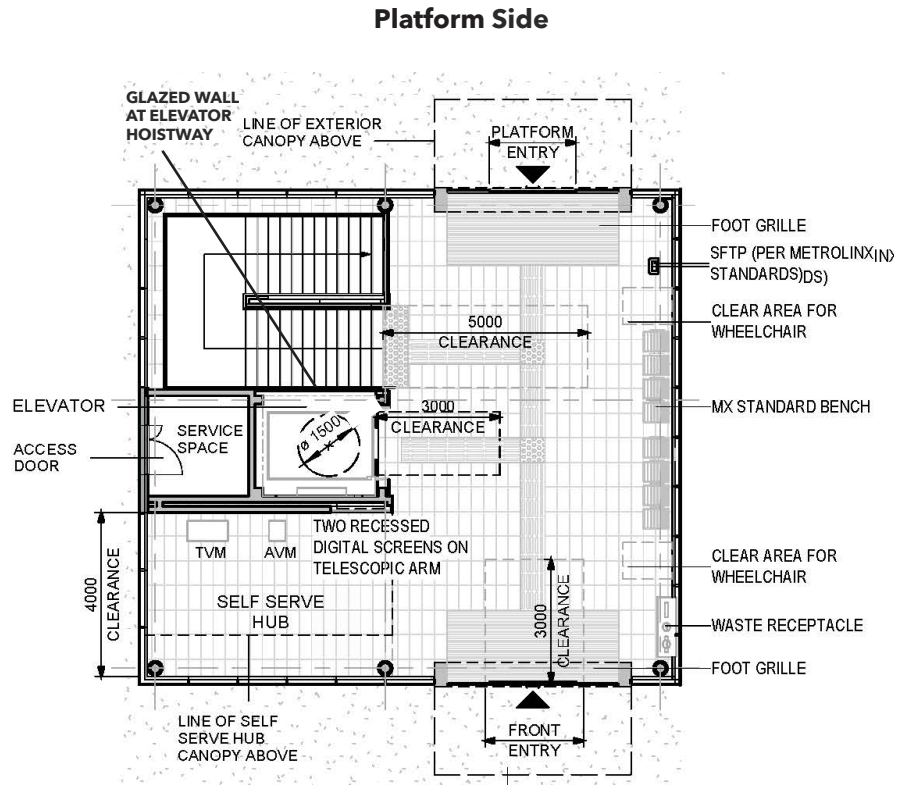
Typical plan of Platform Access Module at an un-staffed Station. Courtesy Waiting area included.
